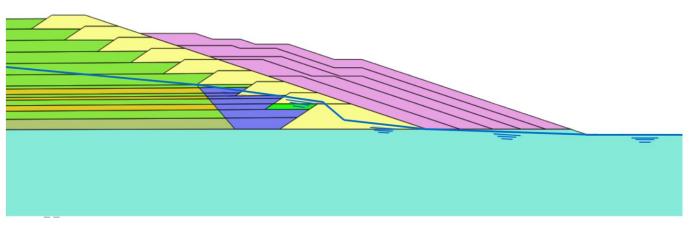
RSF2 Filling, Stage 11, Blanket Excavation
